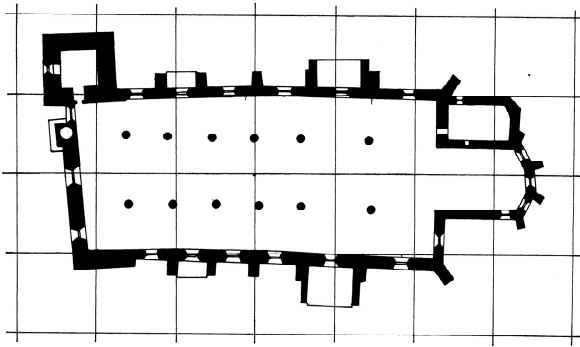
(a): Lutheran Church in Bistrița – Church layout
